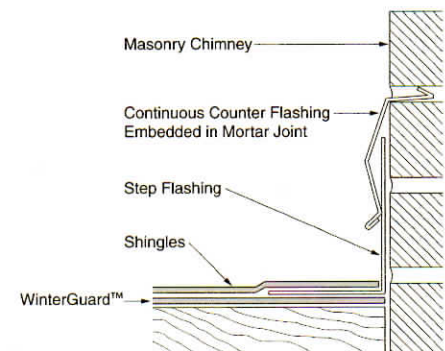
Through-wall metal counter flashing embedded in masonry.
